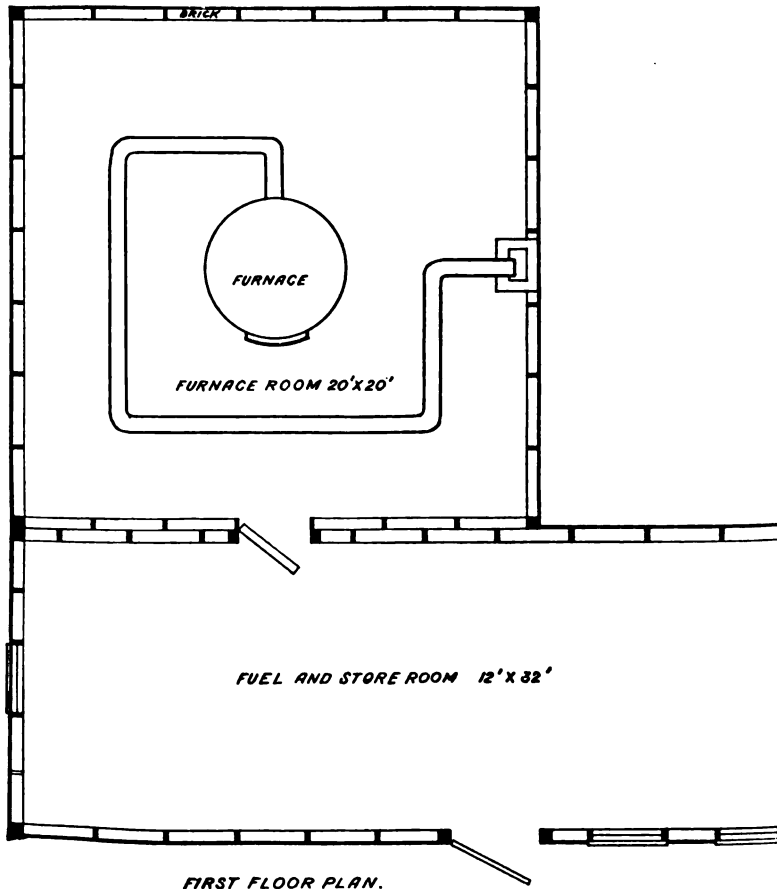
First floor plan of hop-kiln type of evaporator.
